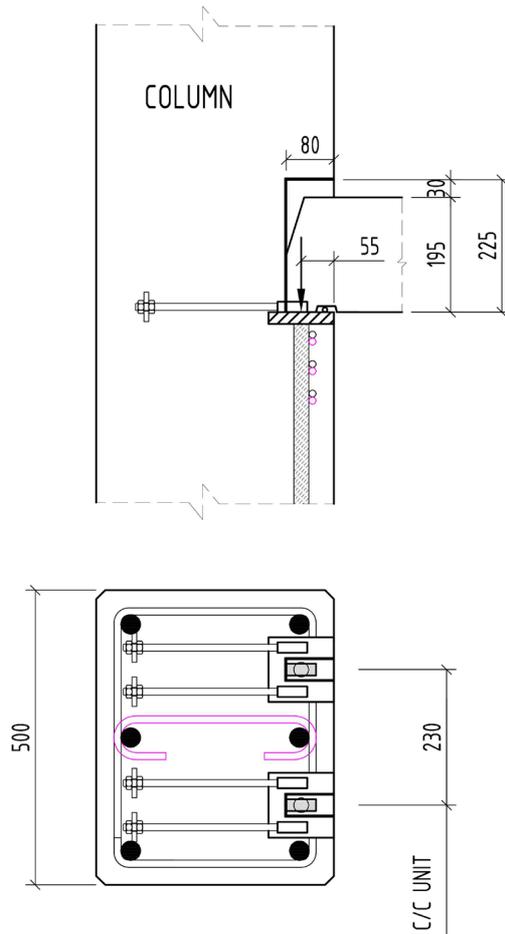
BSF225 column unit. (Reinforcement is not illustrated complete.)
